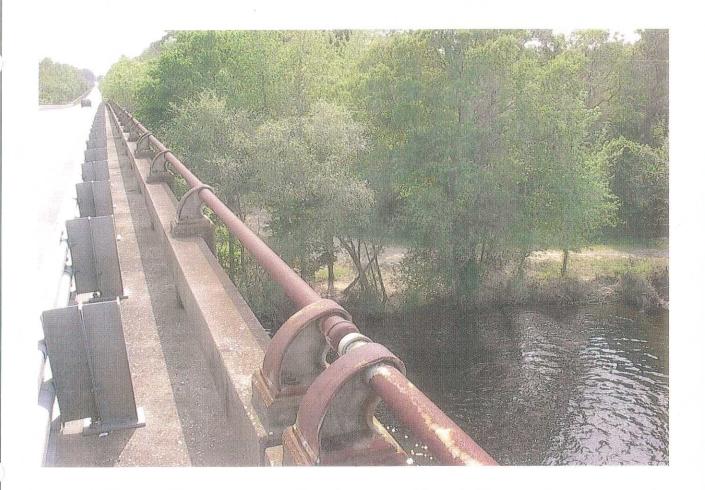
View of south bank from on top of the PeeDee River Bridge. Wooded area beyond road is marshy.
